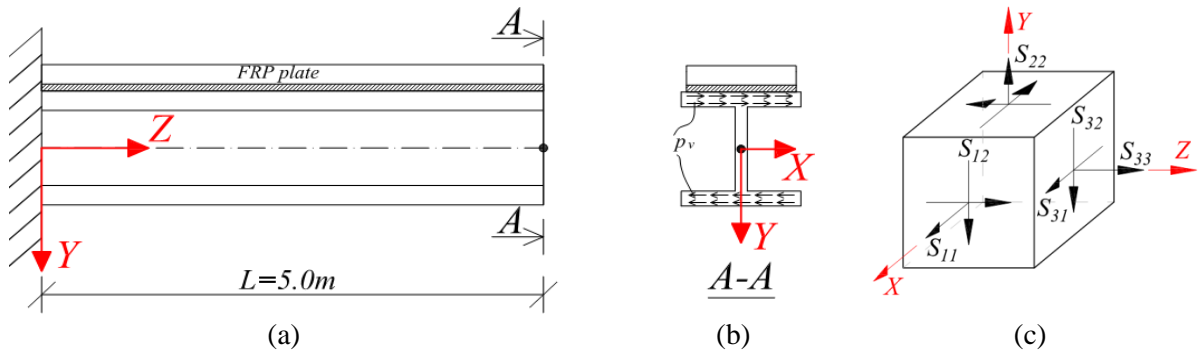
Cantilever beam reinforced with GFRP plate (a) Elevation, (b) Cross-sectional view at tip with tractions inducing twist and (c) Stress components of an element.
